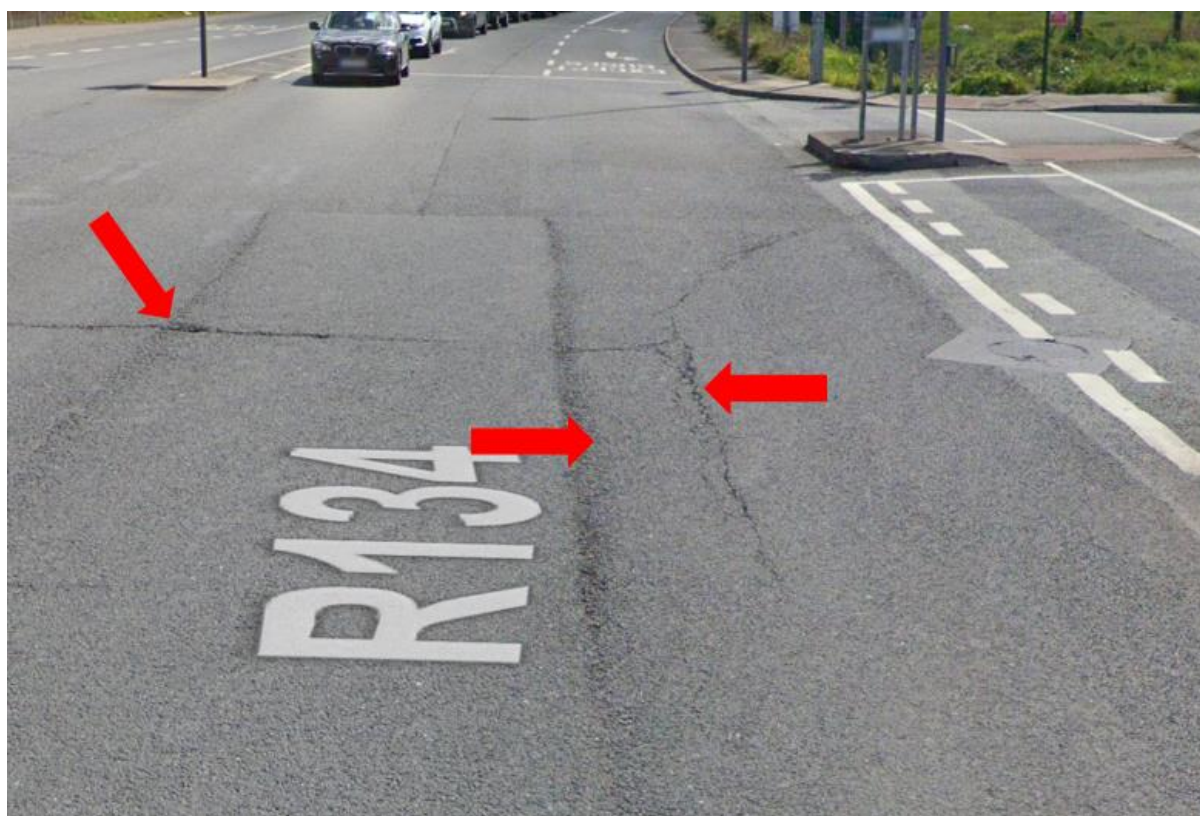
Localised Poor Road Pavement Condition at Kildare Road / Windmill Road Junction
